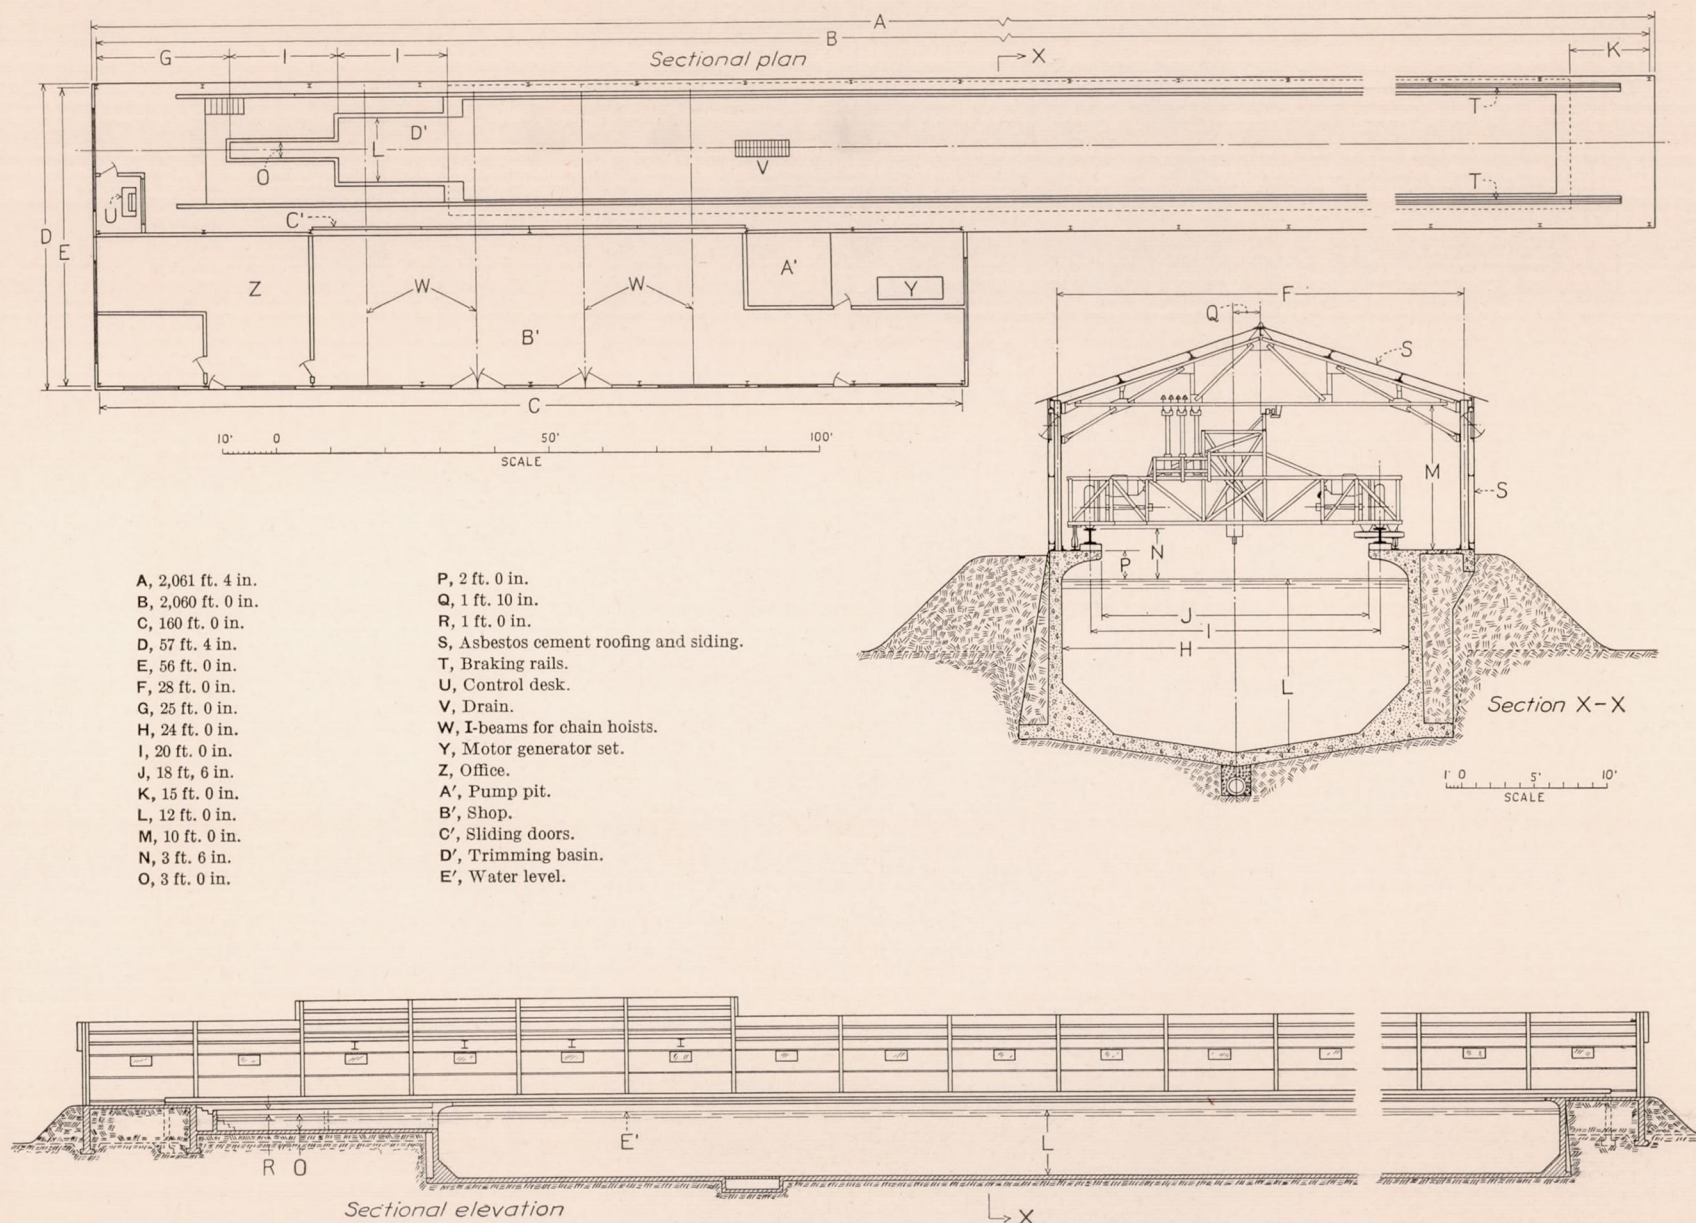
Plan and section of the N.A.C.A. tank.
